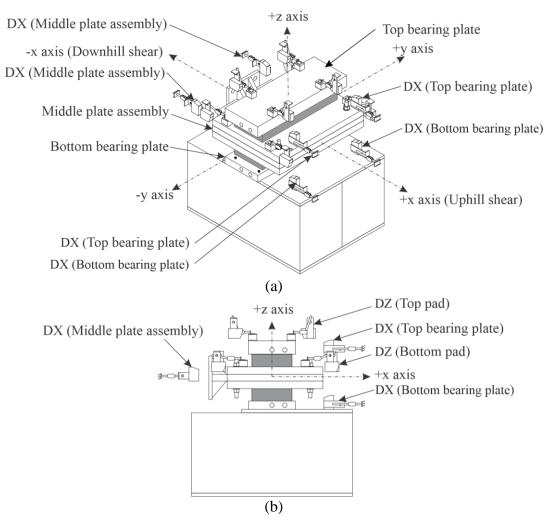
Laser sensors instrumentation plan: (a) Isometric view; (b) Elevation view
